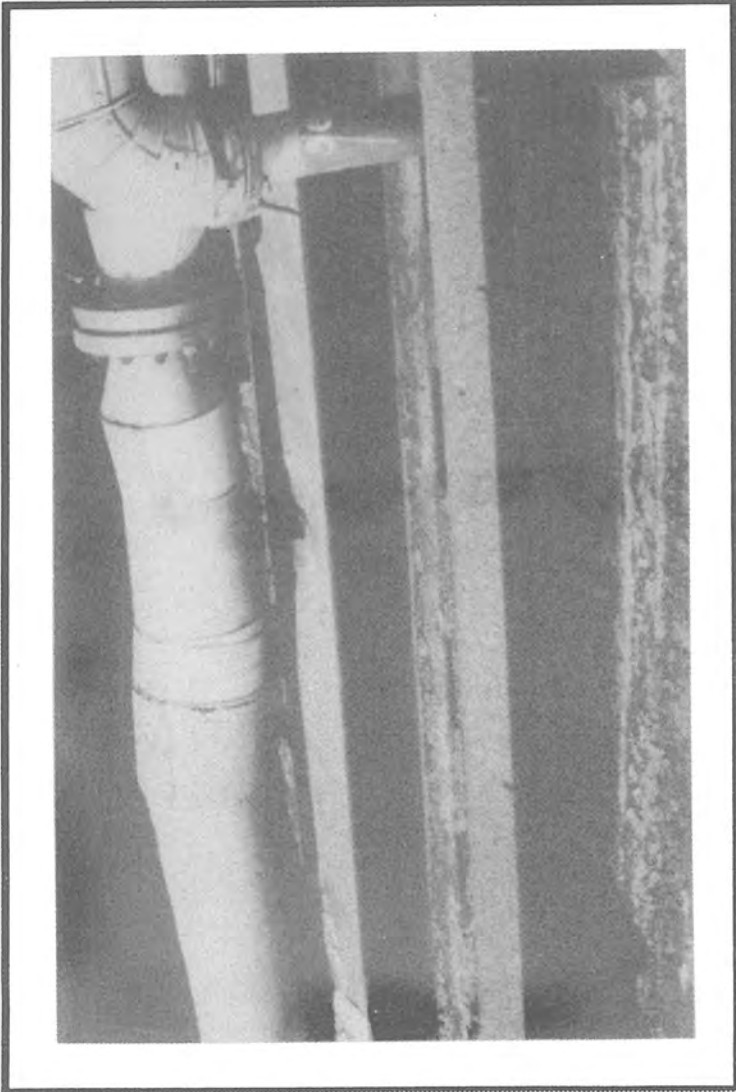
DISTILLER 1A REPLACED AND CORRODED ROOF I-BEAM
